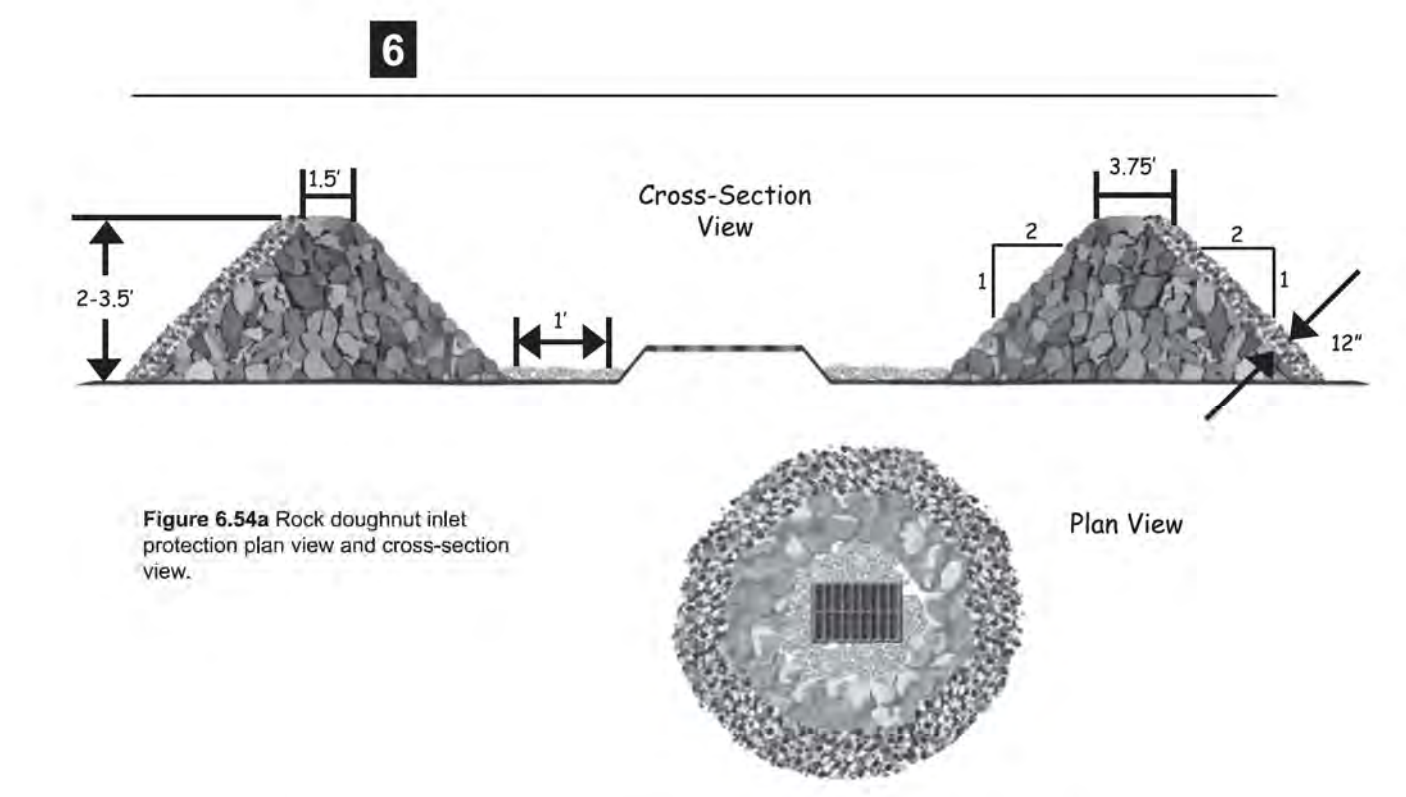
Rock doughnut inlet protection plan view and cross-section view.
